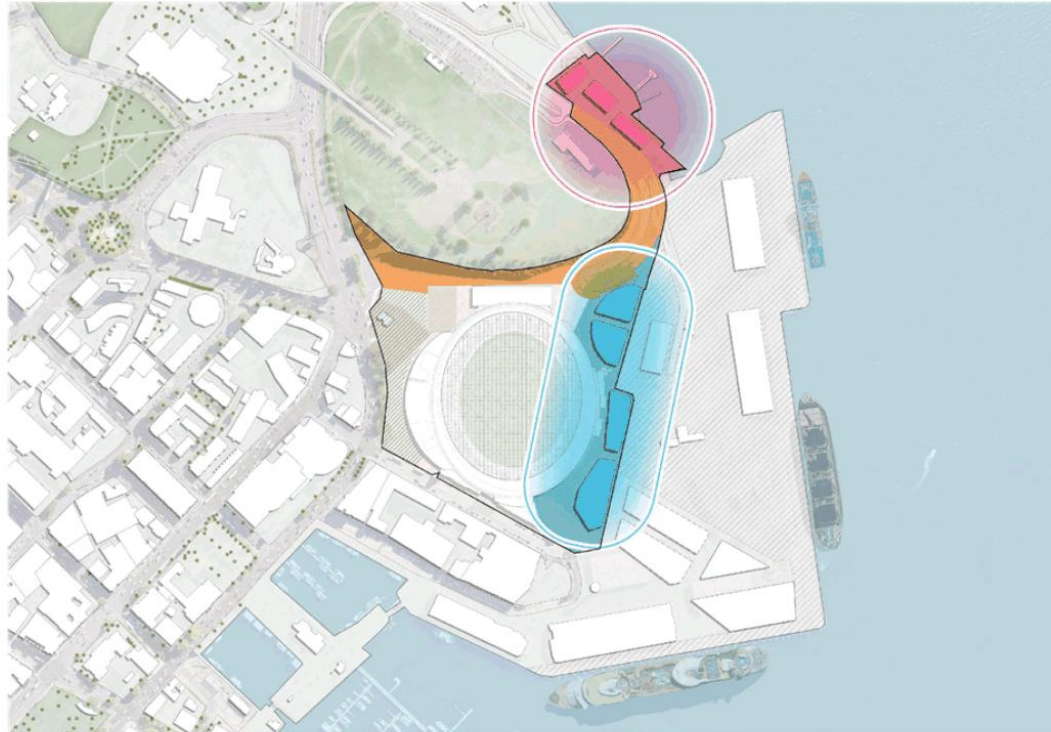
Mac Point Master Plan highlighting the three Zones for future built form development
